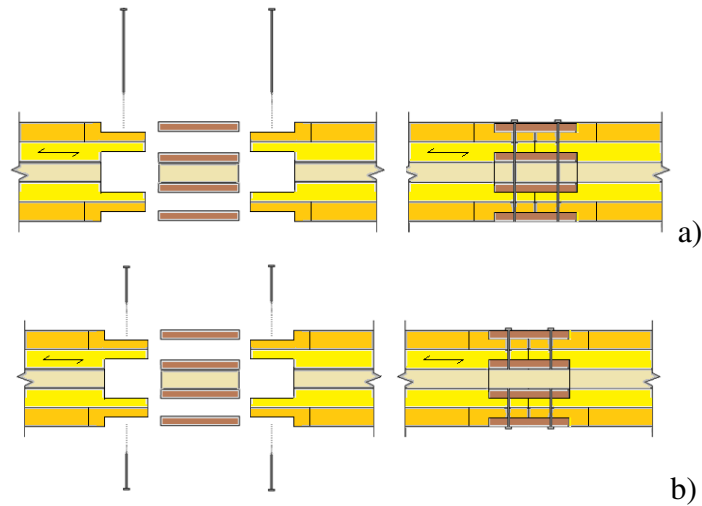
Hybrid spline and SIP beam solution for aligned wall-to-wall or lateral floor-to-floor connections: a) with full-length fasteners; b) with partial length fasteners (double shear planes).
